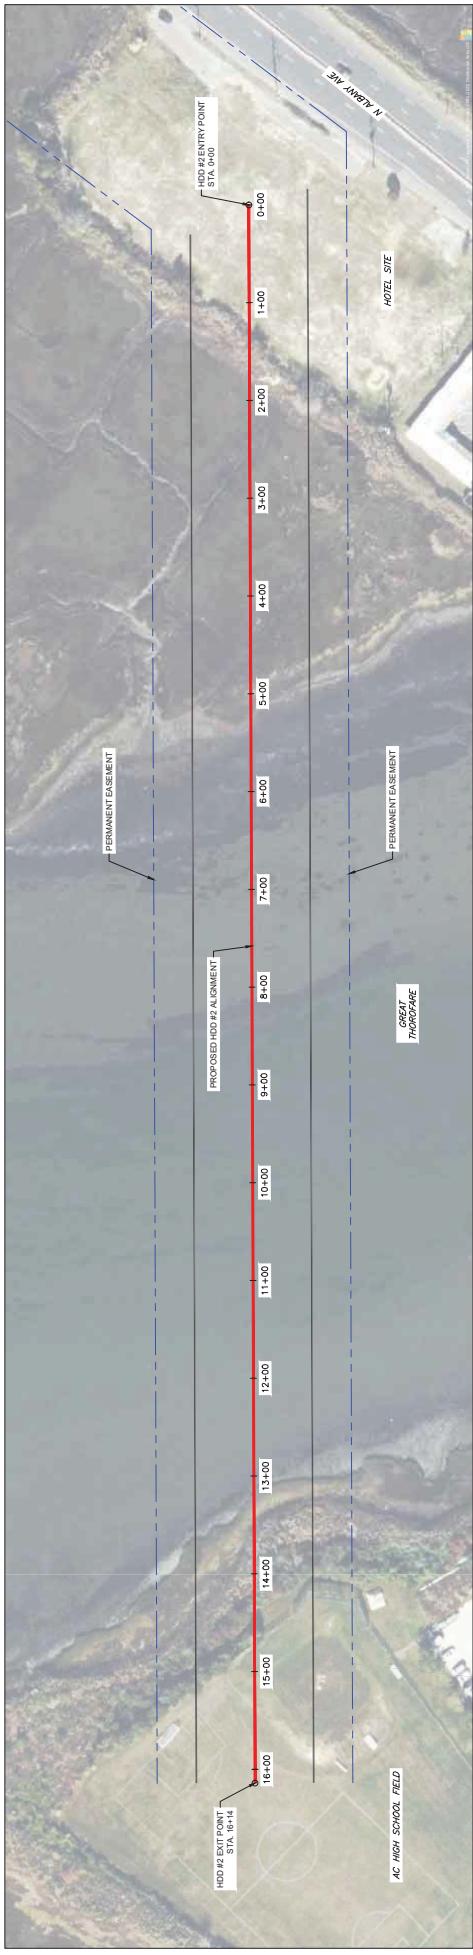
Great ThoroFare Crossing #5 HDD Plan & Profile
